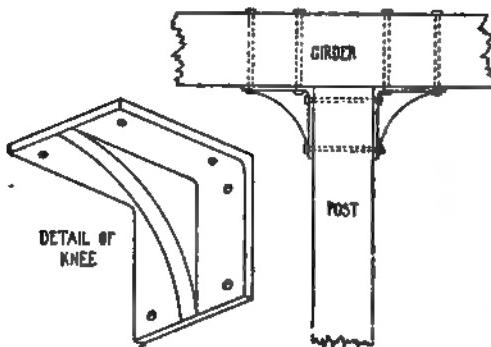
Knee-Bracing of Wooden Post to Wooden Girder.
